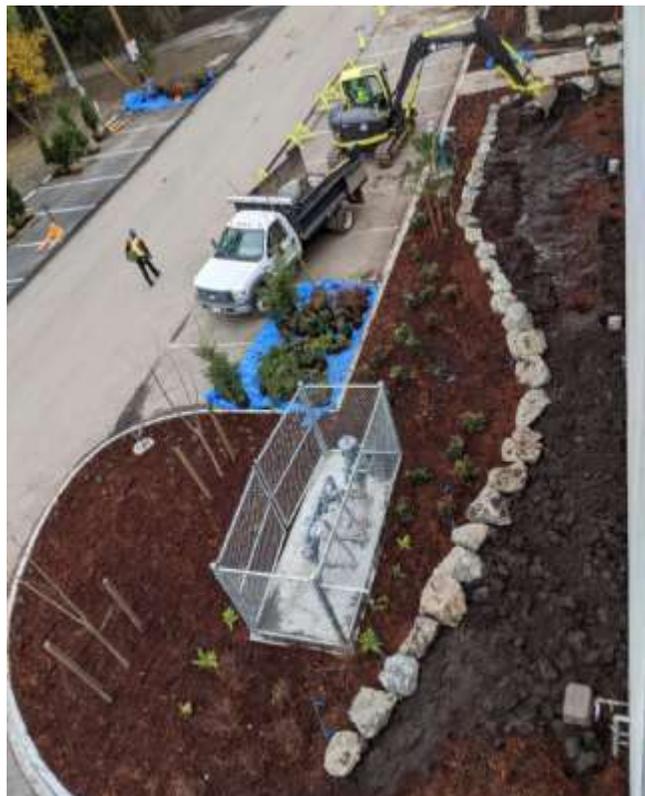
McLoughlin Point Wastewater Treatment Plant- Rock installation at landscape area west of process building.
